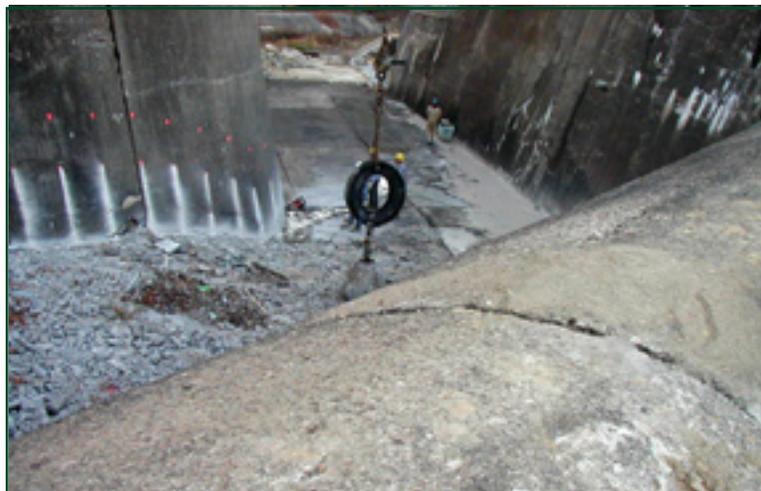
Wrecking ball on crane used to break up the spillway floor.
